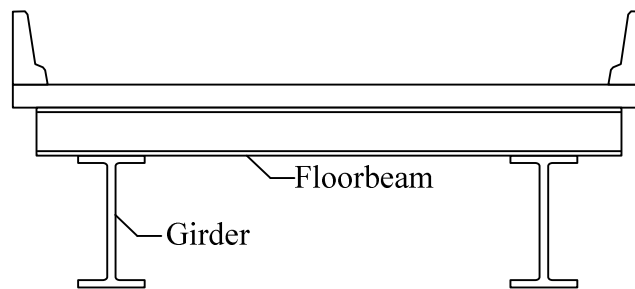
STEEL GIRDER-FLOORBEAM SYSTEM
